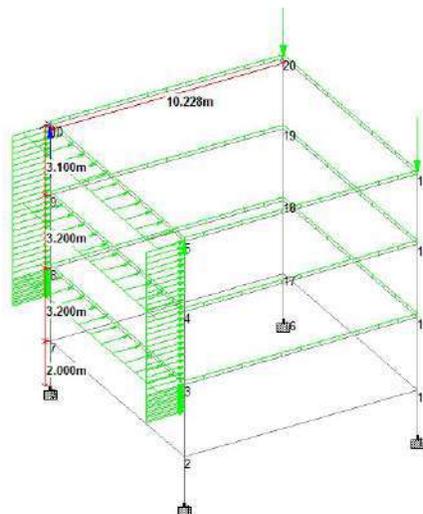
Horizontal loads on beams and pedestals in longitudinal and Transverse direction
